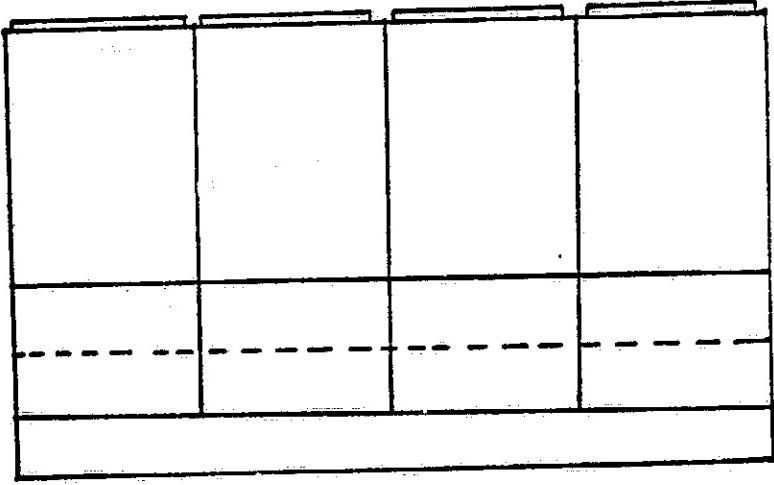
FBOS AND MBOS PLAN VIEW
